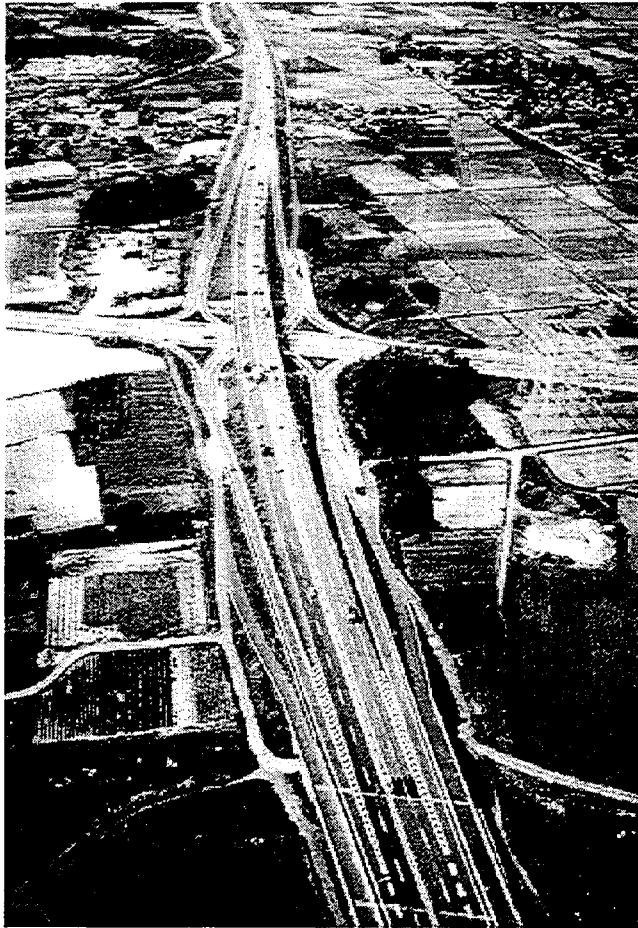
Single Point Diamond, Japan; Photo Provided by Public Works Research Institute, Japan
